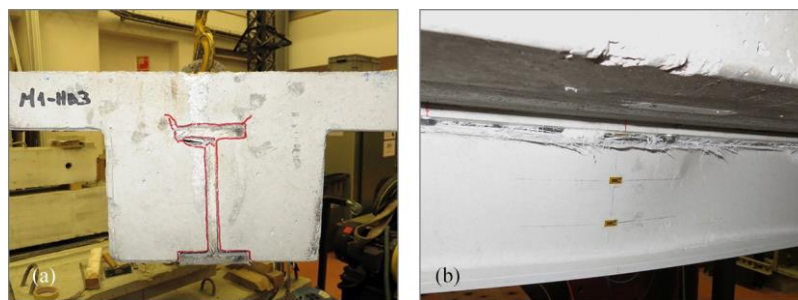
Failure characteristics of hybrid beams model M1 and M2 in test setup II: (a) M1 – profile top web-flange shear delamination; (b) M2 – profile top web-flange shear failure followed by global web buckling.
